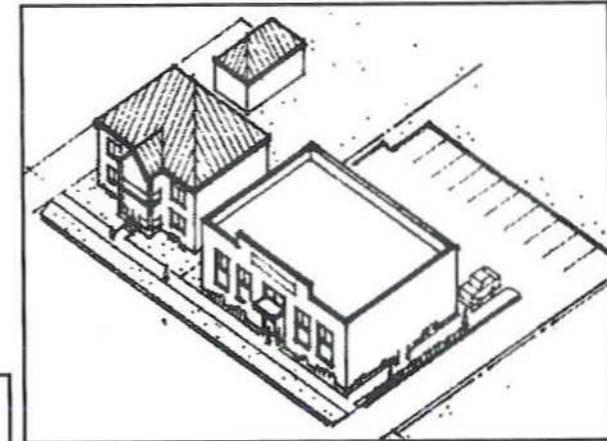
Example of structures in mixed-use district that are located along the 10-foot "build-to-line" with parking areas sited behind the buildings.
